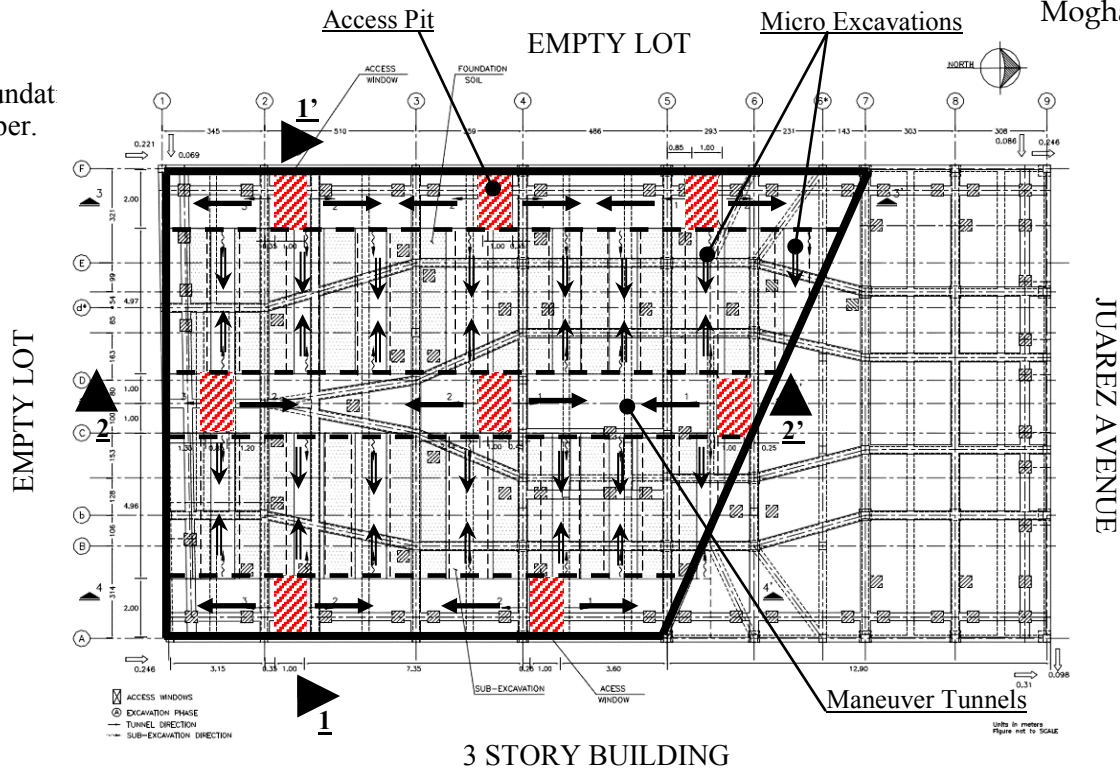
Access Pits, Maneuver tunnels, and Micro-Excavations
